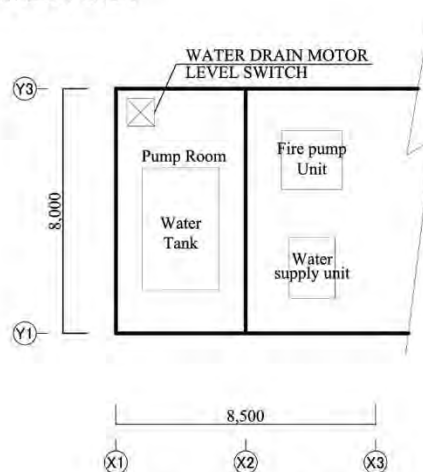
Layout Plan for Equipment /machinery in Anse La Raye
